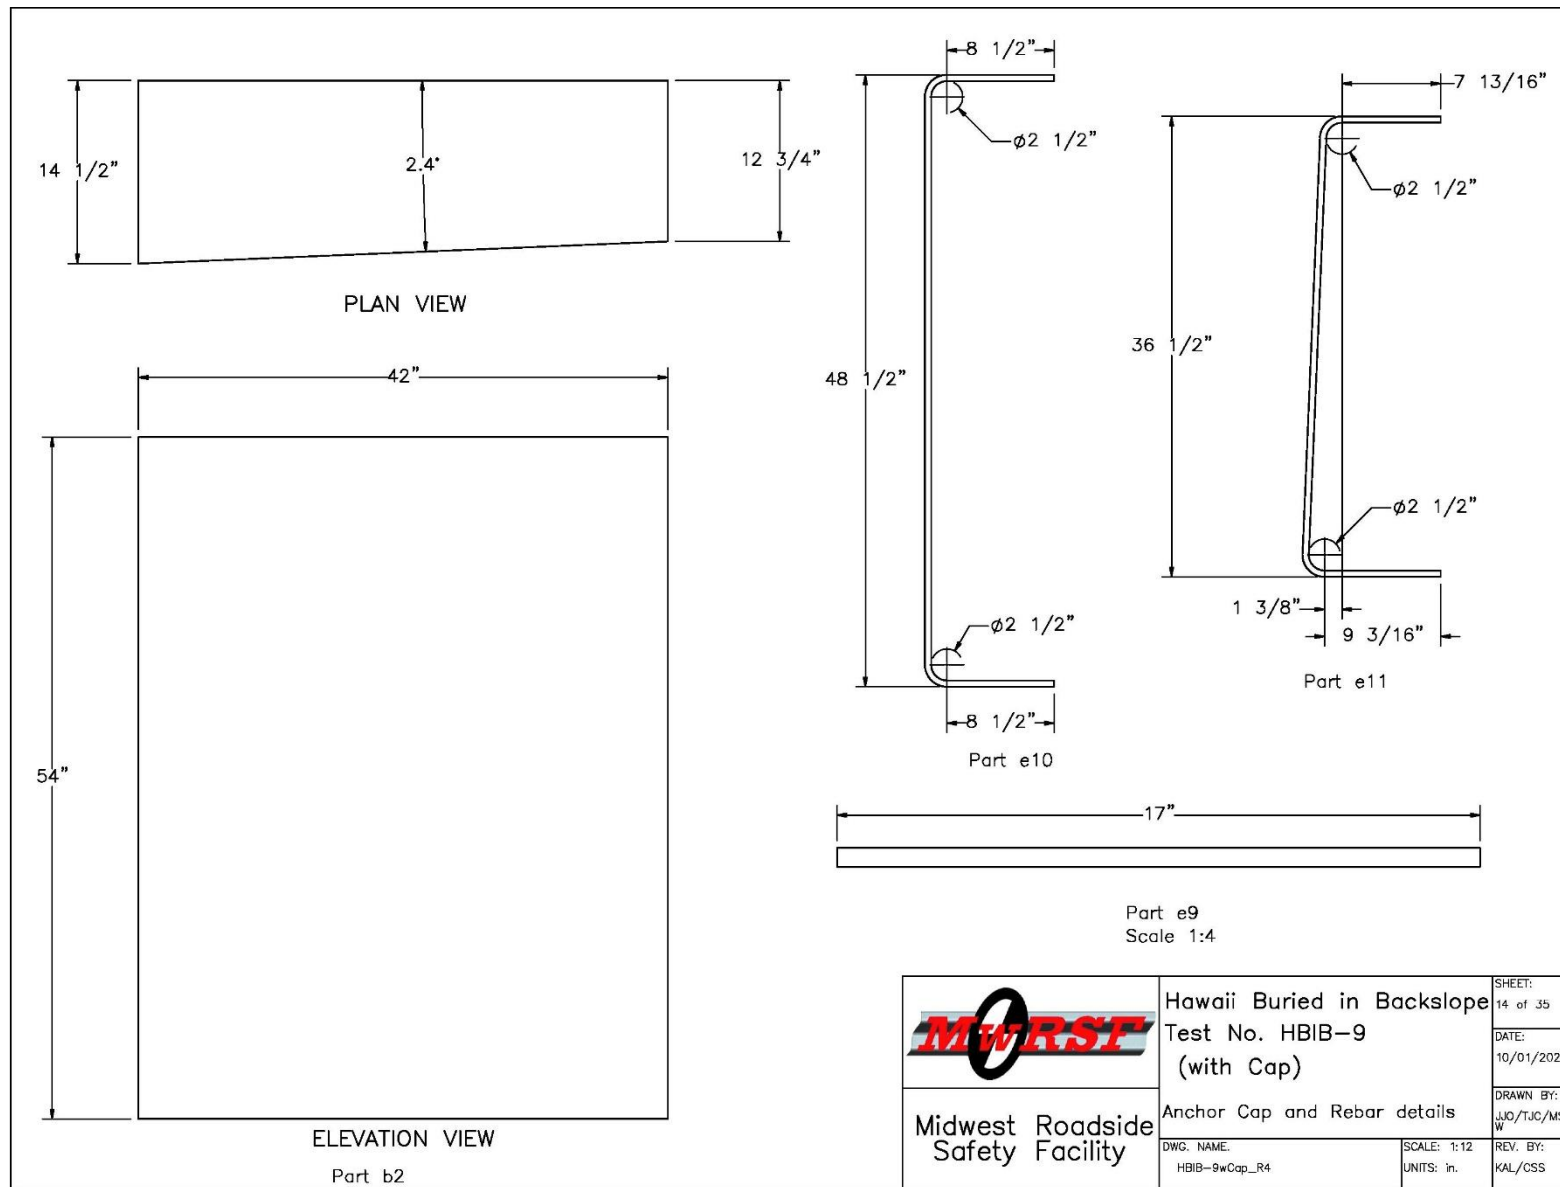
Anchor Cap and Rebar Details, Test No. HBIB-9
